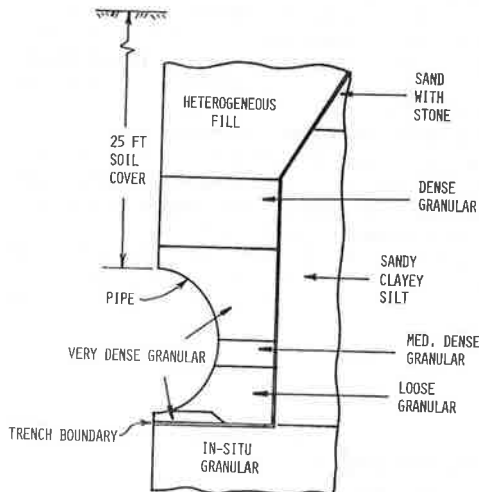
Bedding conditions for trench installation in East Liberty, Ohio.
